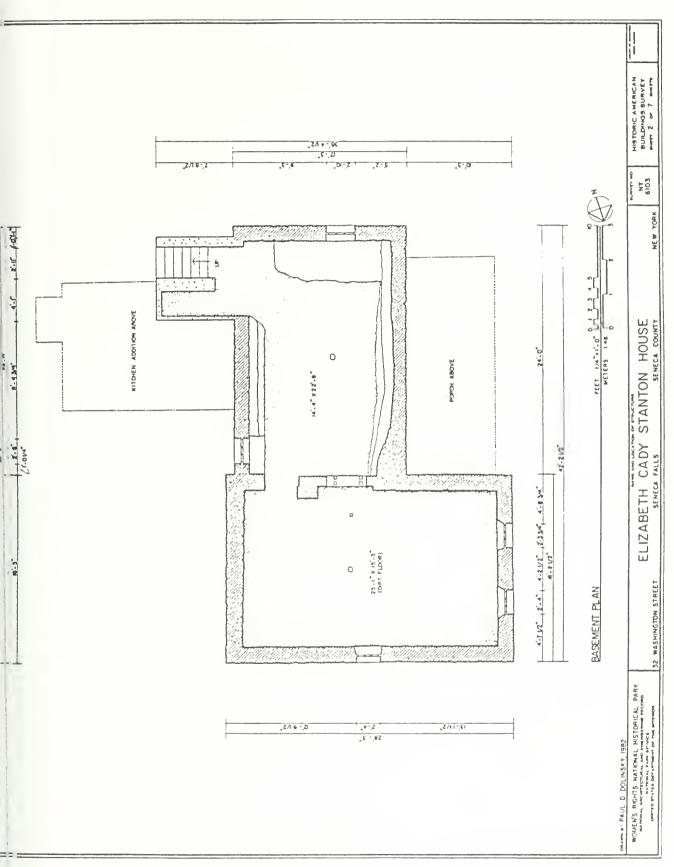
Stanton House: basement [cellar] plan, summer 1982.
